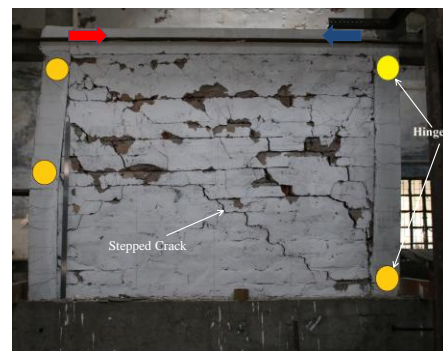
Damaged specimen at -5% story drift of control specimen (IM)
